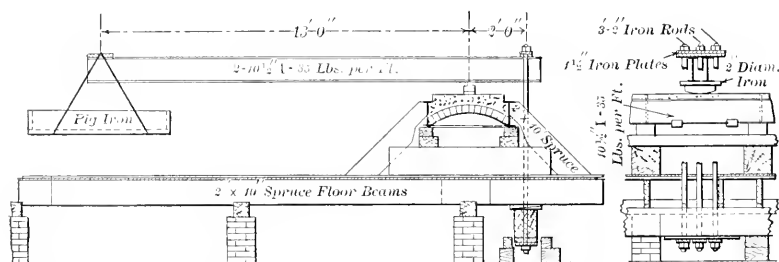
TEST OF ARCHES PROPOSED FOR DRIVEWAY FLOOR OF THE WEYBOSSET BRIDGE.
